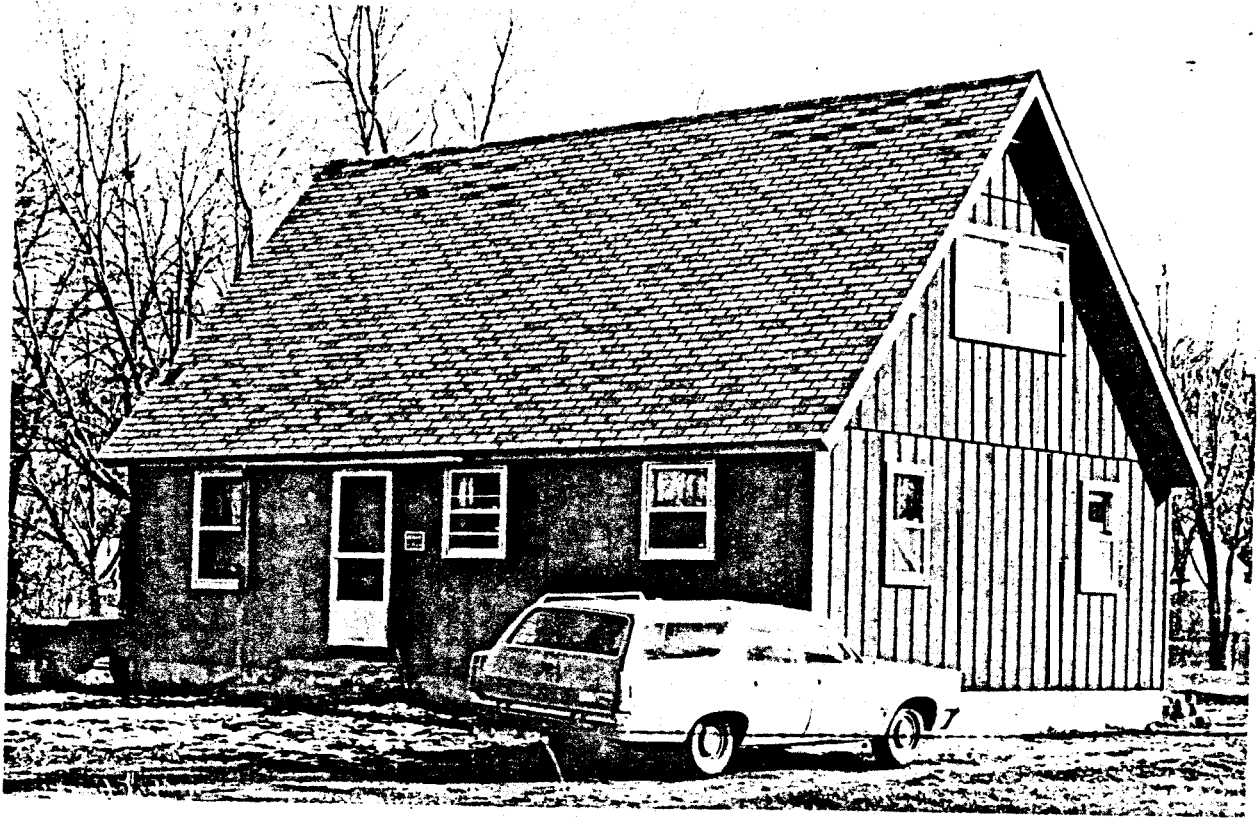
Five-bedroom house on poured concrete basement from plan FS-FPL-2. Contract price inclusive of septic tank and city water hookup was \$13,700.
